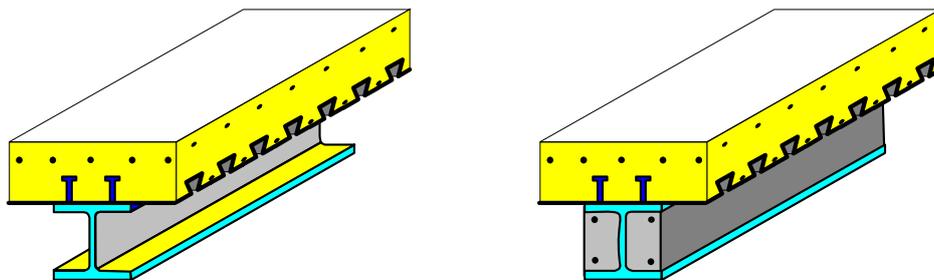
examples of composite beams (I steel profiles connected to composite slabs)
